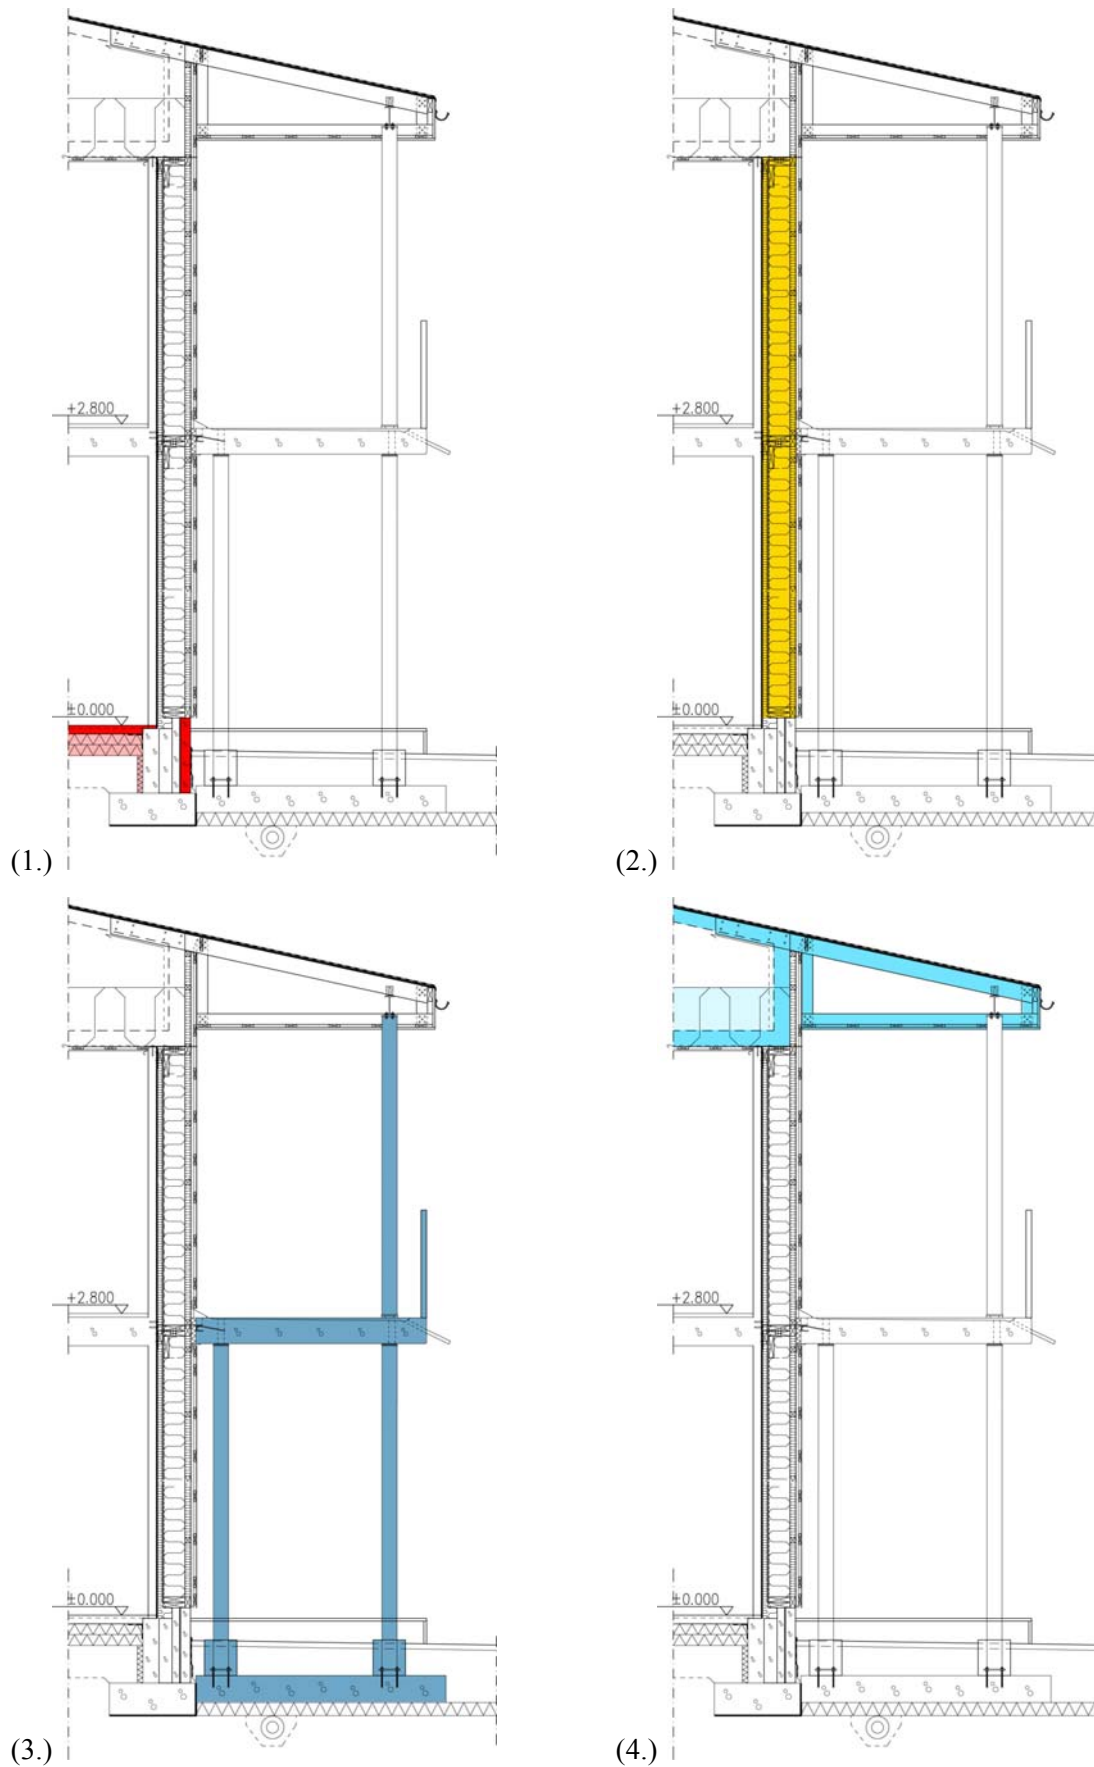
Section drawing of demo building's south facade highlighting (1) the new ground slab and foundations for TES-elements (2), the TES Timber-based Element System installed over the existing concrete shell, (3) new prefabricated steel and concrete balconies, and (4) the new roof and external shading (M3 Architects 2012)
